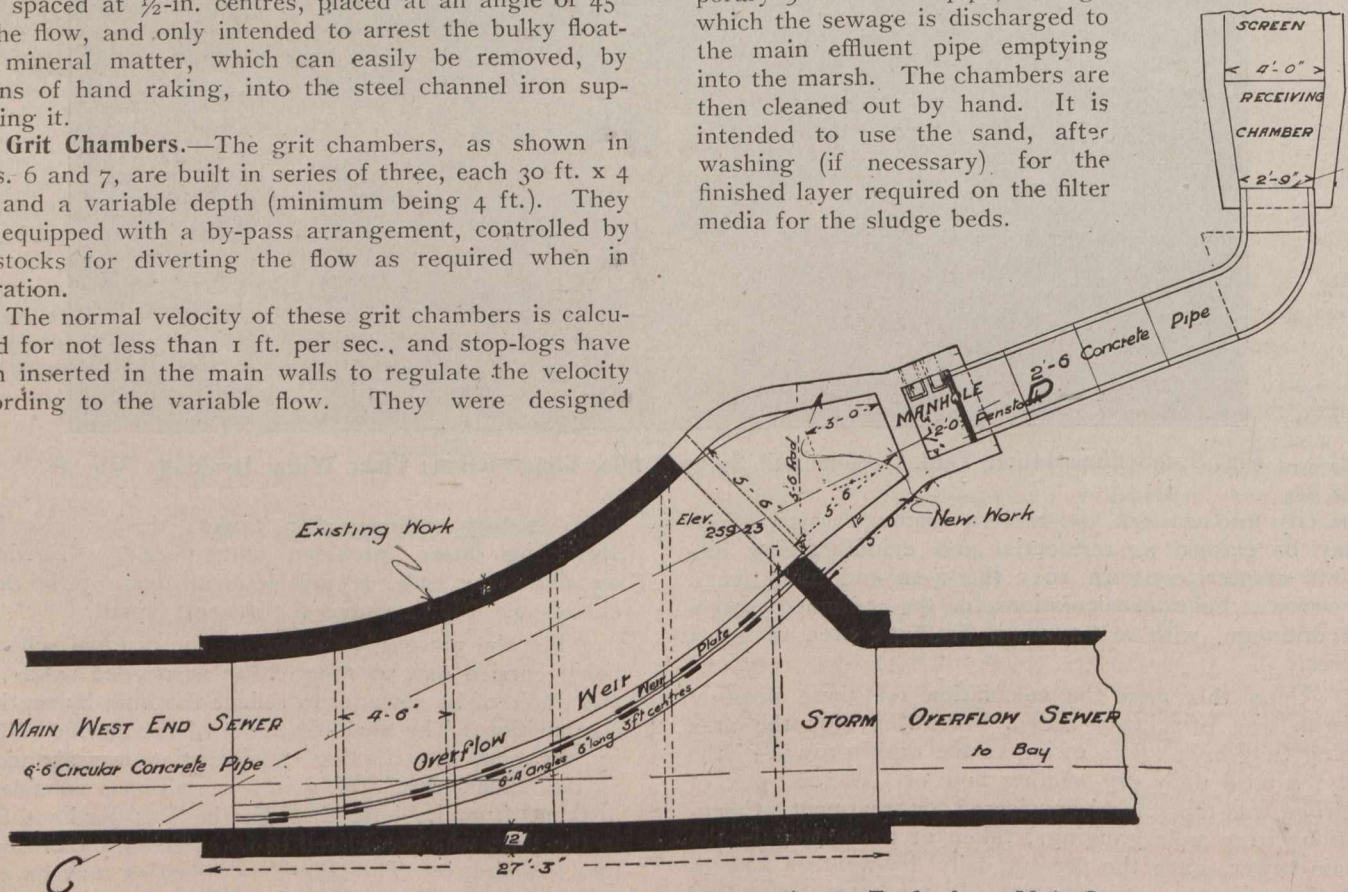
Plan of Overflow Chamber and Connection to Tanks from Main Sewer.
